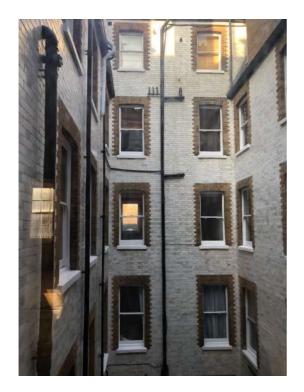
Existing Lightwell (Elevation 8) (Looking straight at WIN 0/16)
